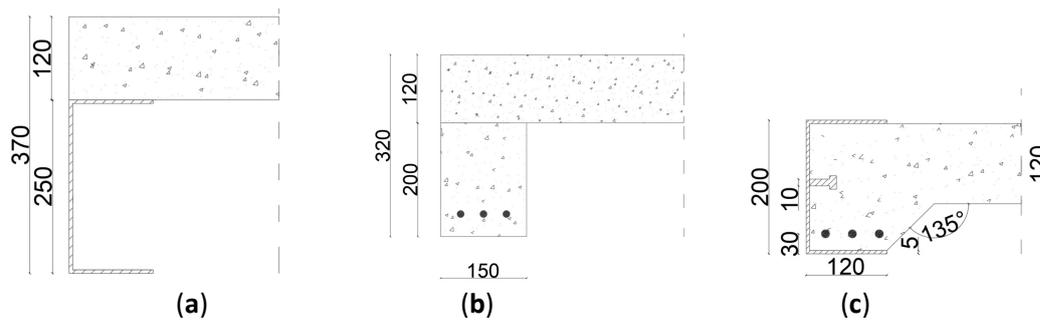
Floor slab supports: (a) PFC-section, (b) Concrete beam, (c) Integrated steel-concrete beam (own work).
